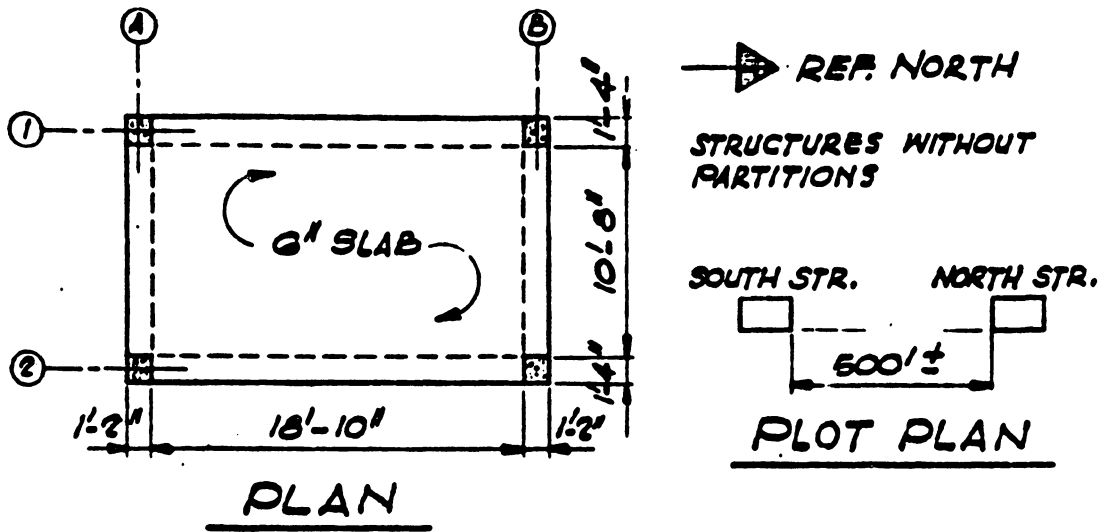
REINFORCED CONCRETE 4-STORY TEST STRUCTURE
